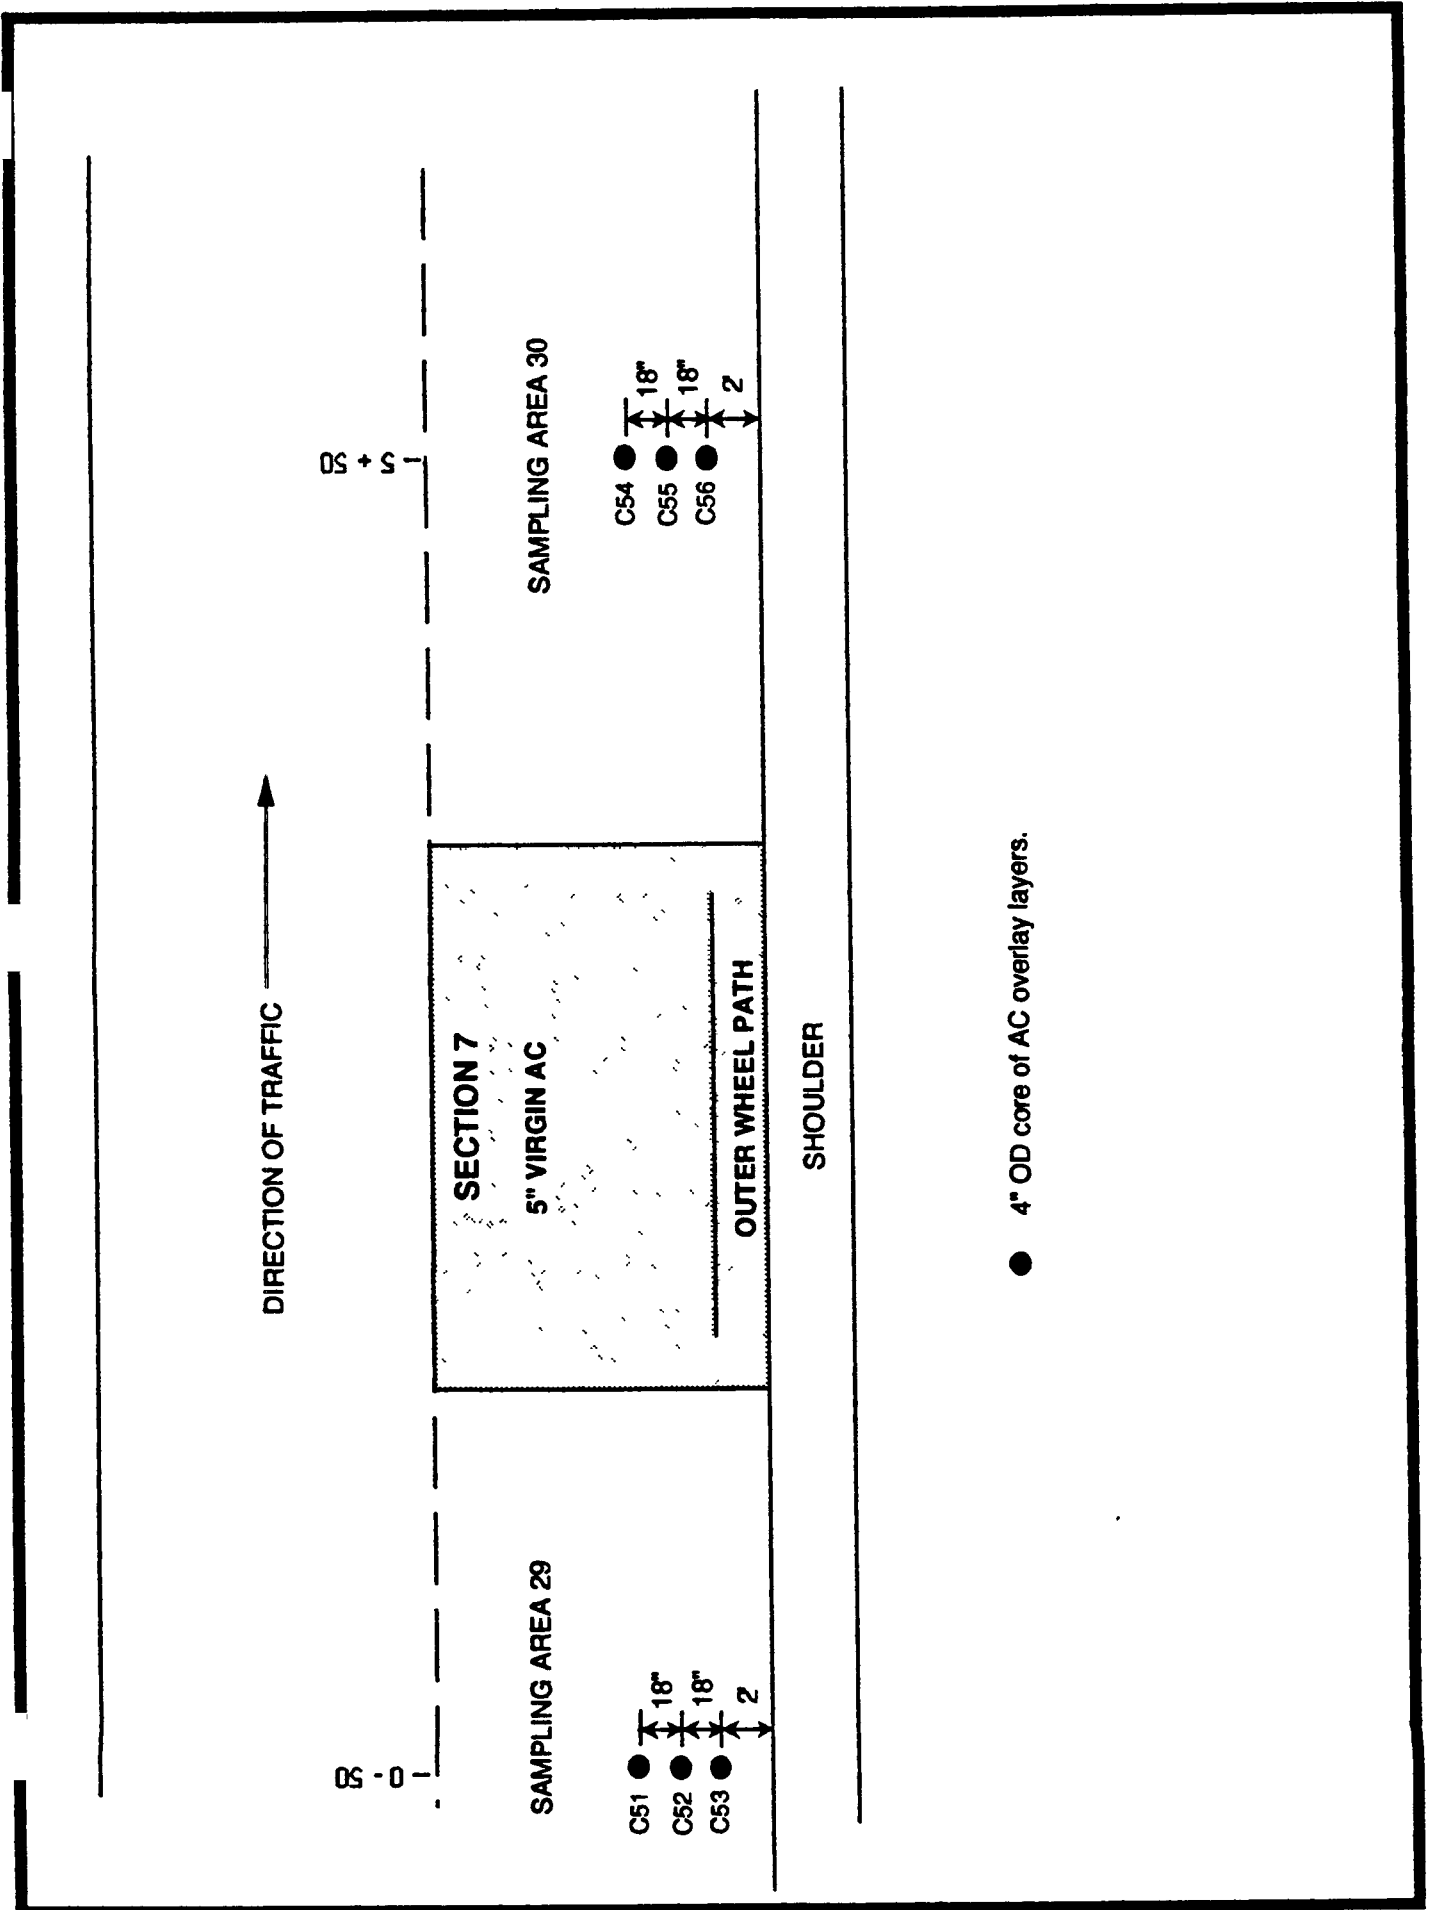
Example of "Post-Construction" Sampling Plan for Section 7.
